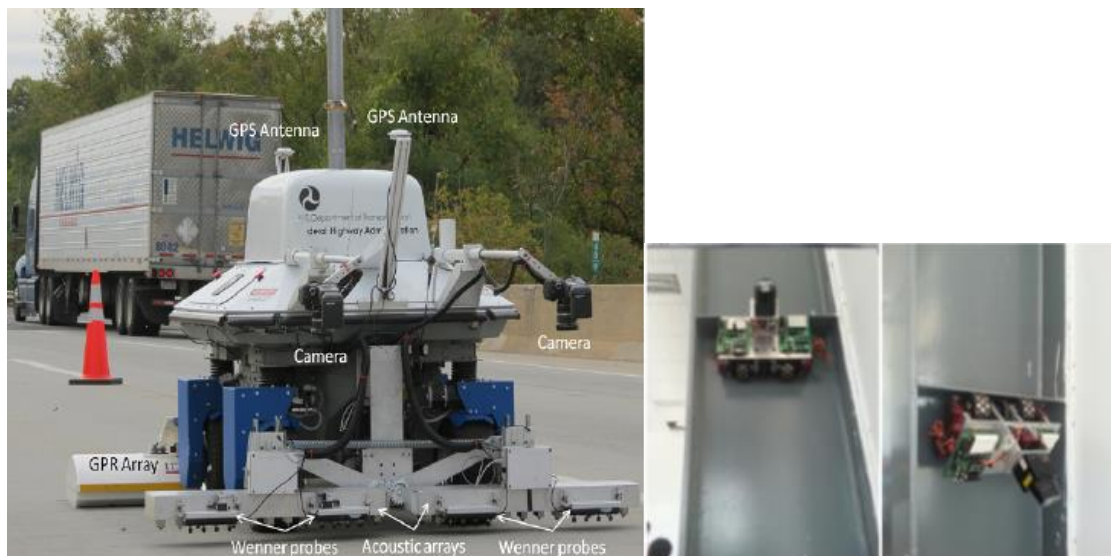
(left) From [36] RABIT terrestrial robotic inspection tool for bridge decks. (right) From [37] steel structure climbing robot for inspection bridge supporting structures.
